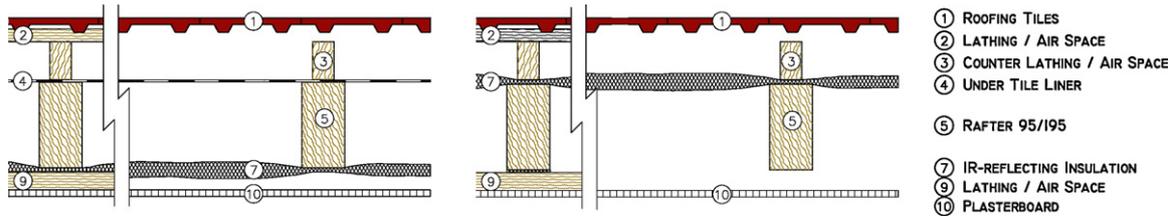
RI roof construction 1 (under-rafter insulation) and 2 (over-rafter insulation).
